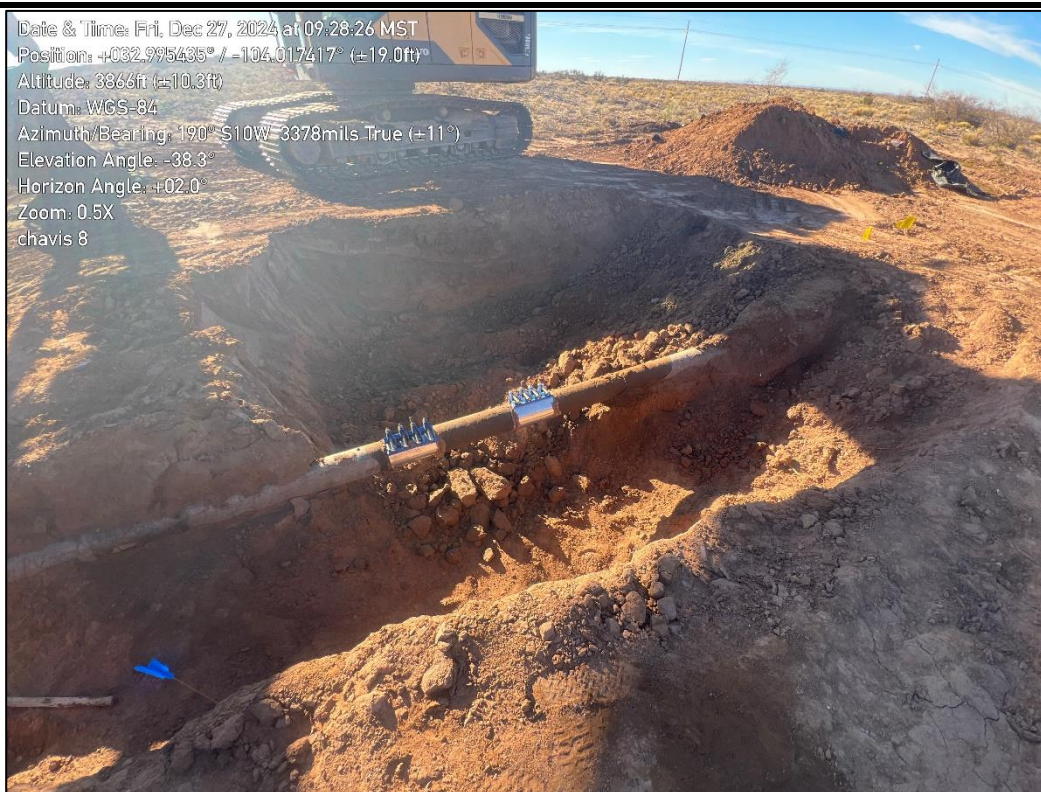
Southwestern view of excavation extent. 12/27/2024
